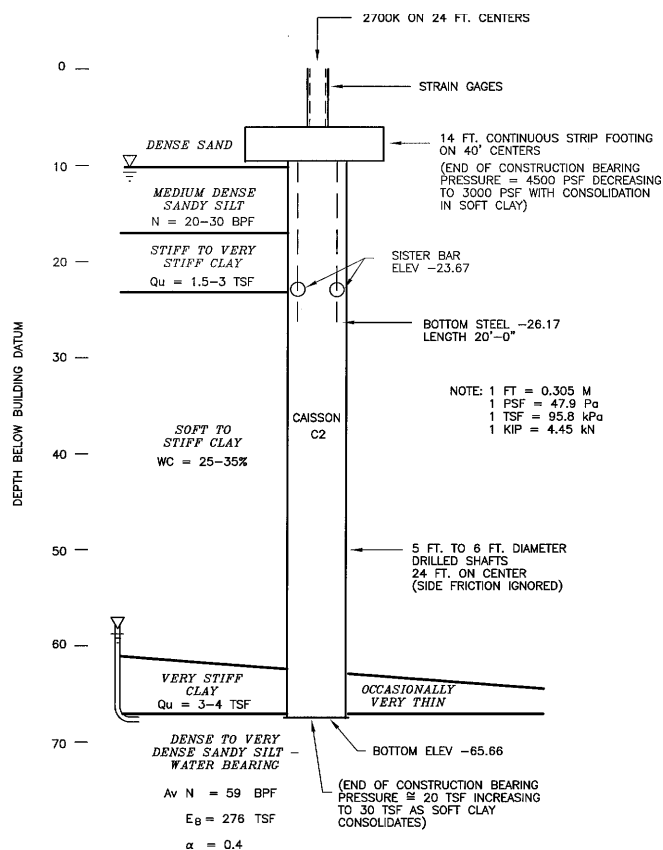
Soil profile, combined strip footing and drilled shaft foundation, and instrumentation
